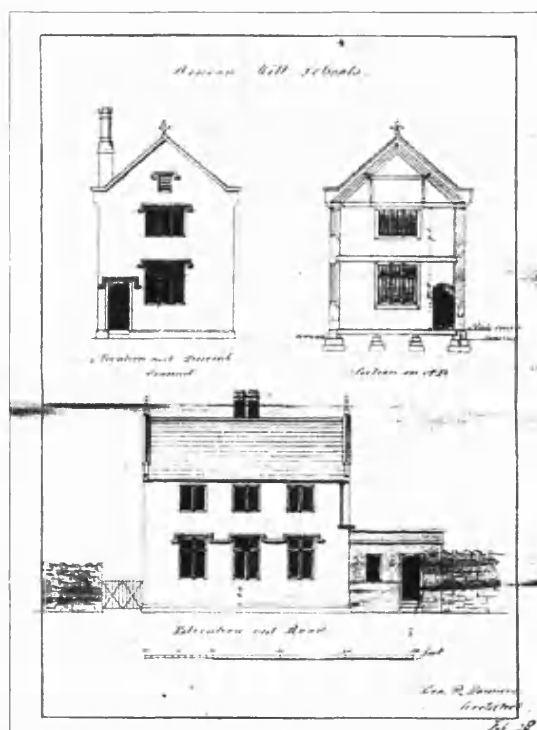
Beacon Hill Schools. 'A preliminary design for a variation of the LH wing of the Plan. A compact exercise in Practice Tudor exhibiting standard details of the style: hood mouldings over stone mullioned windows; gables with kneelers and apex cross; octagonal chimneys; plinth course.' 'Geo. P. Manners, Architect, Feb. 1838.' • Biggs 8502.
